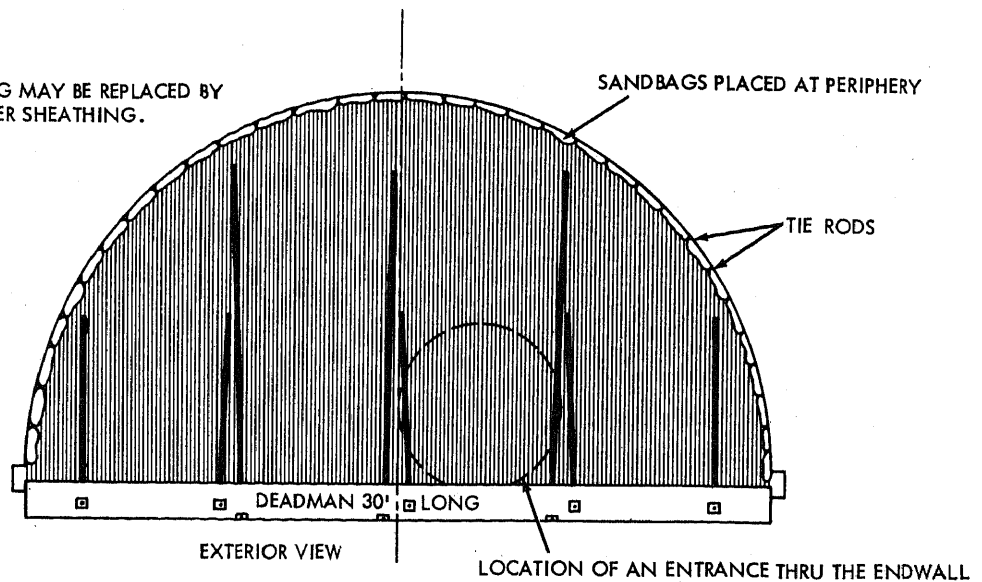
Exterior view of timber-framed, corrugated steel endwall suitable for 50 psi. Shown with 15-foot-radius structure.
